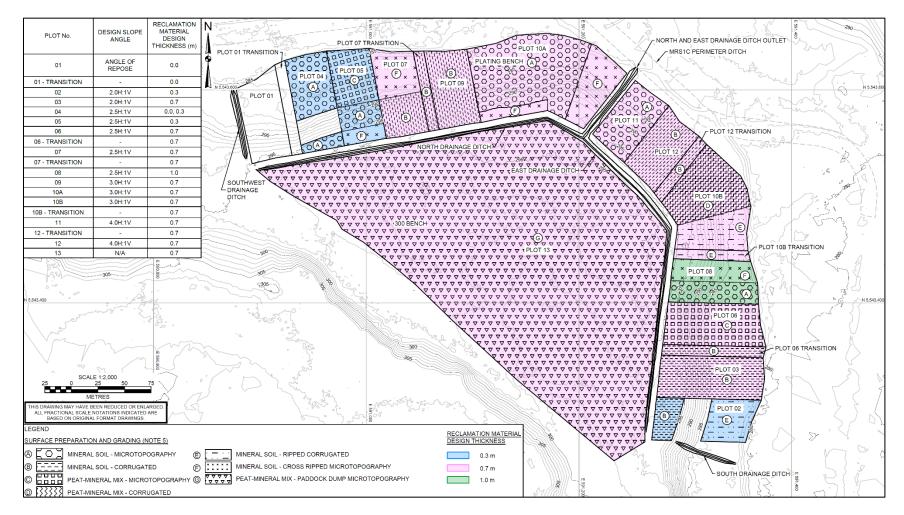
Test Cover Trial reclamation cover material as-built plan.
